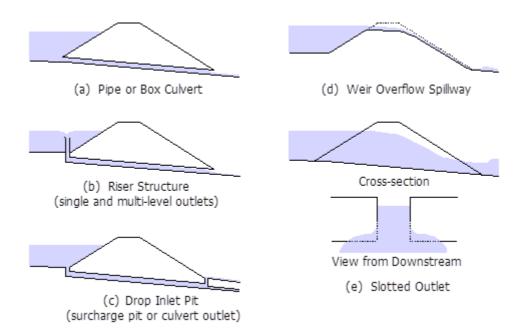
Typical Detention Basin Primary Outlets (after Department of Irrigation and Drainage (2000))
